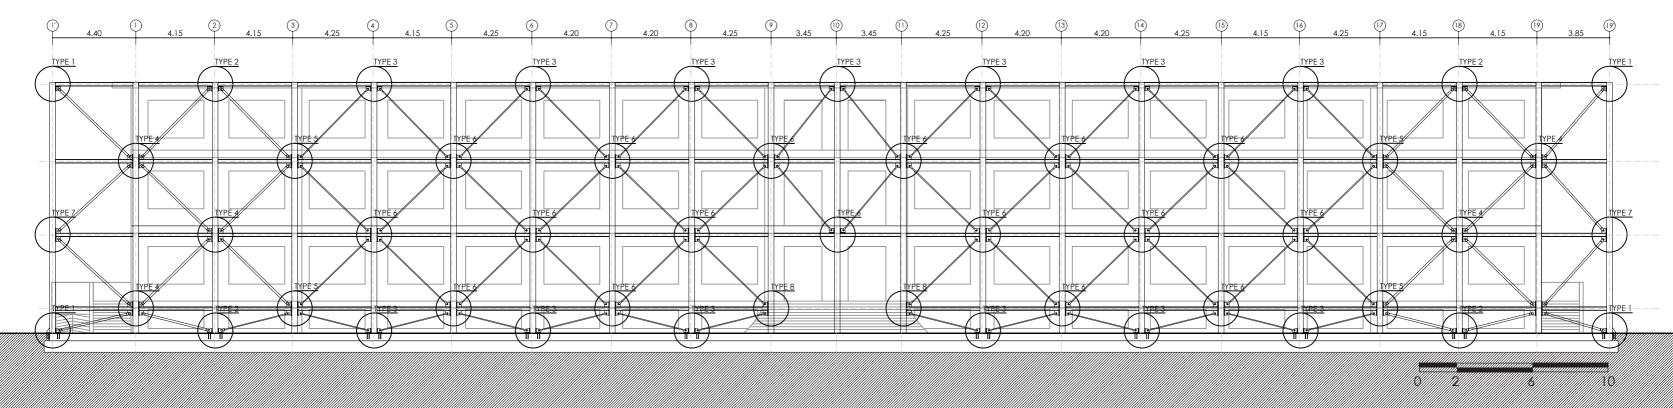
South Facade Construction Details Navigator Typology of connections | Scale 1:200
